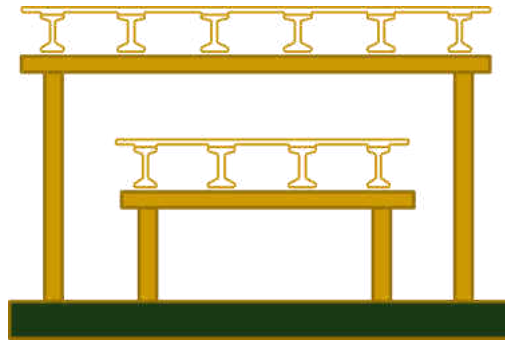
Option III – Bridge Ht. (Proposed Bridge Ht. over Ext. Bridge)
